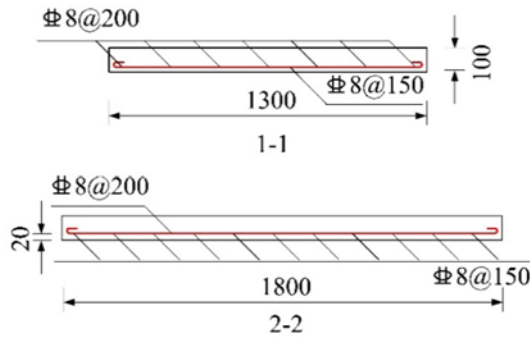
The Size and Reinforcement of Slab (unit: mm)
